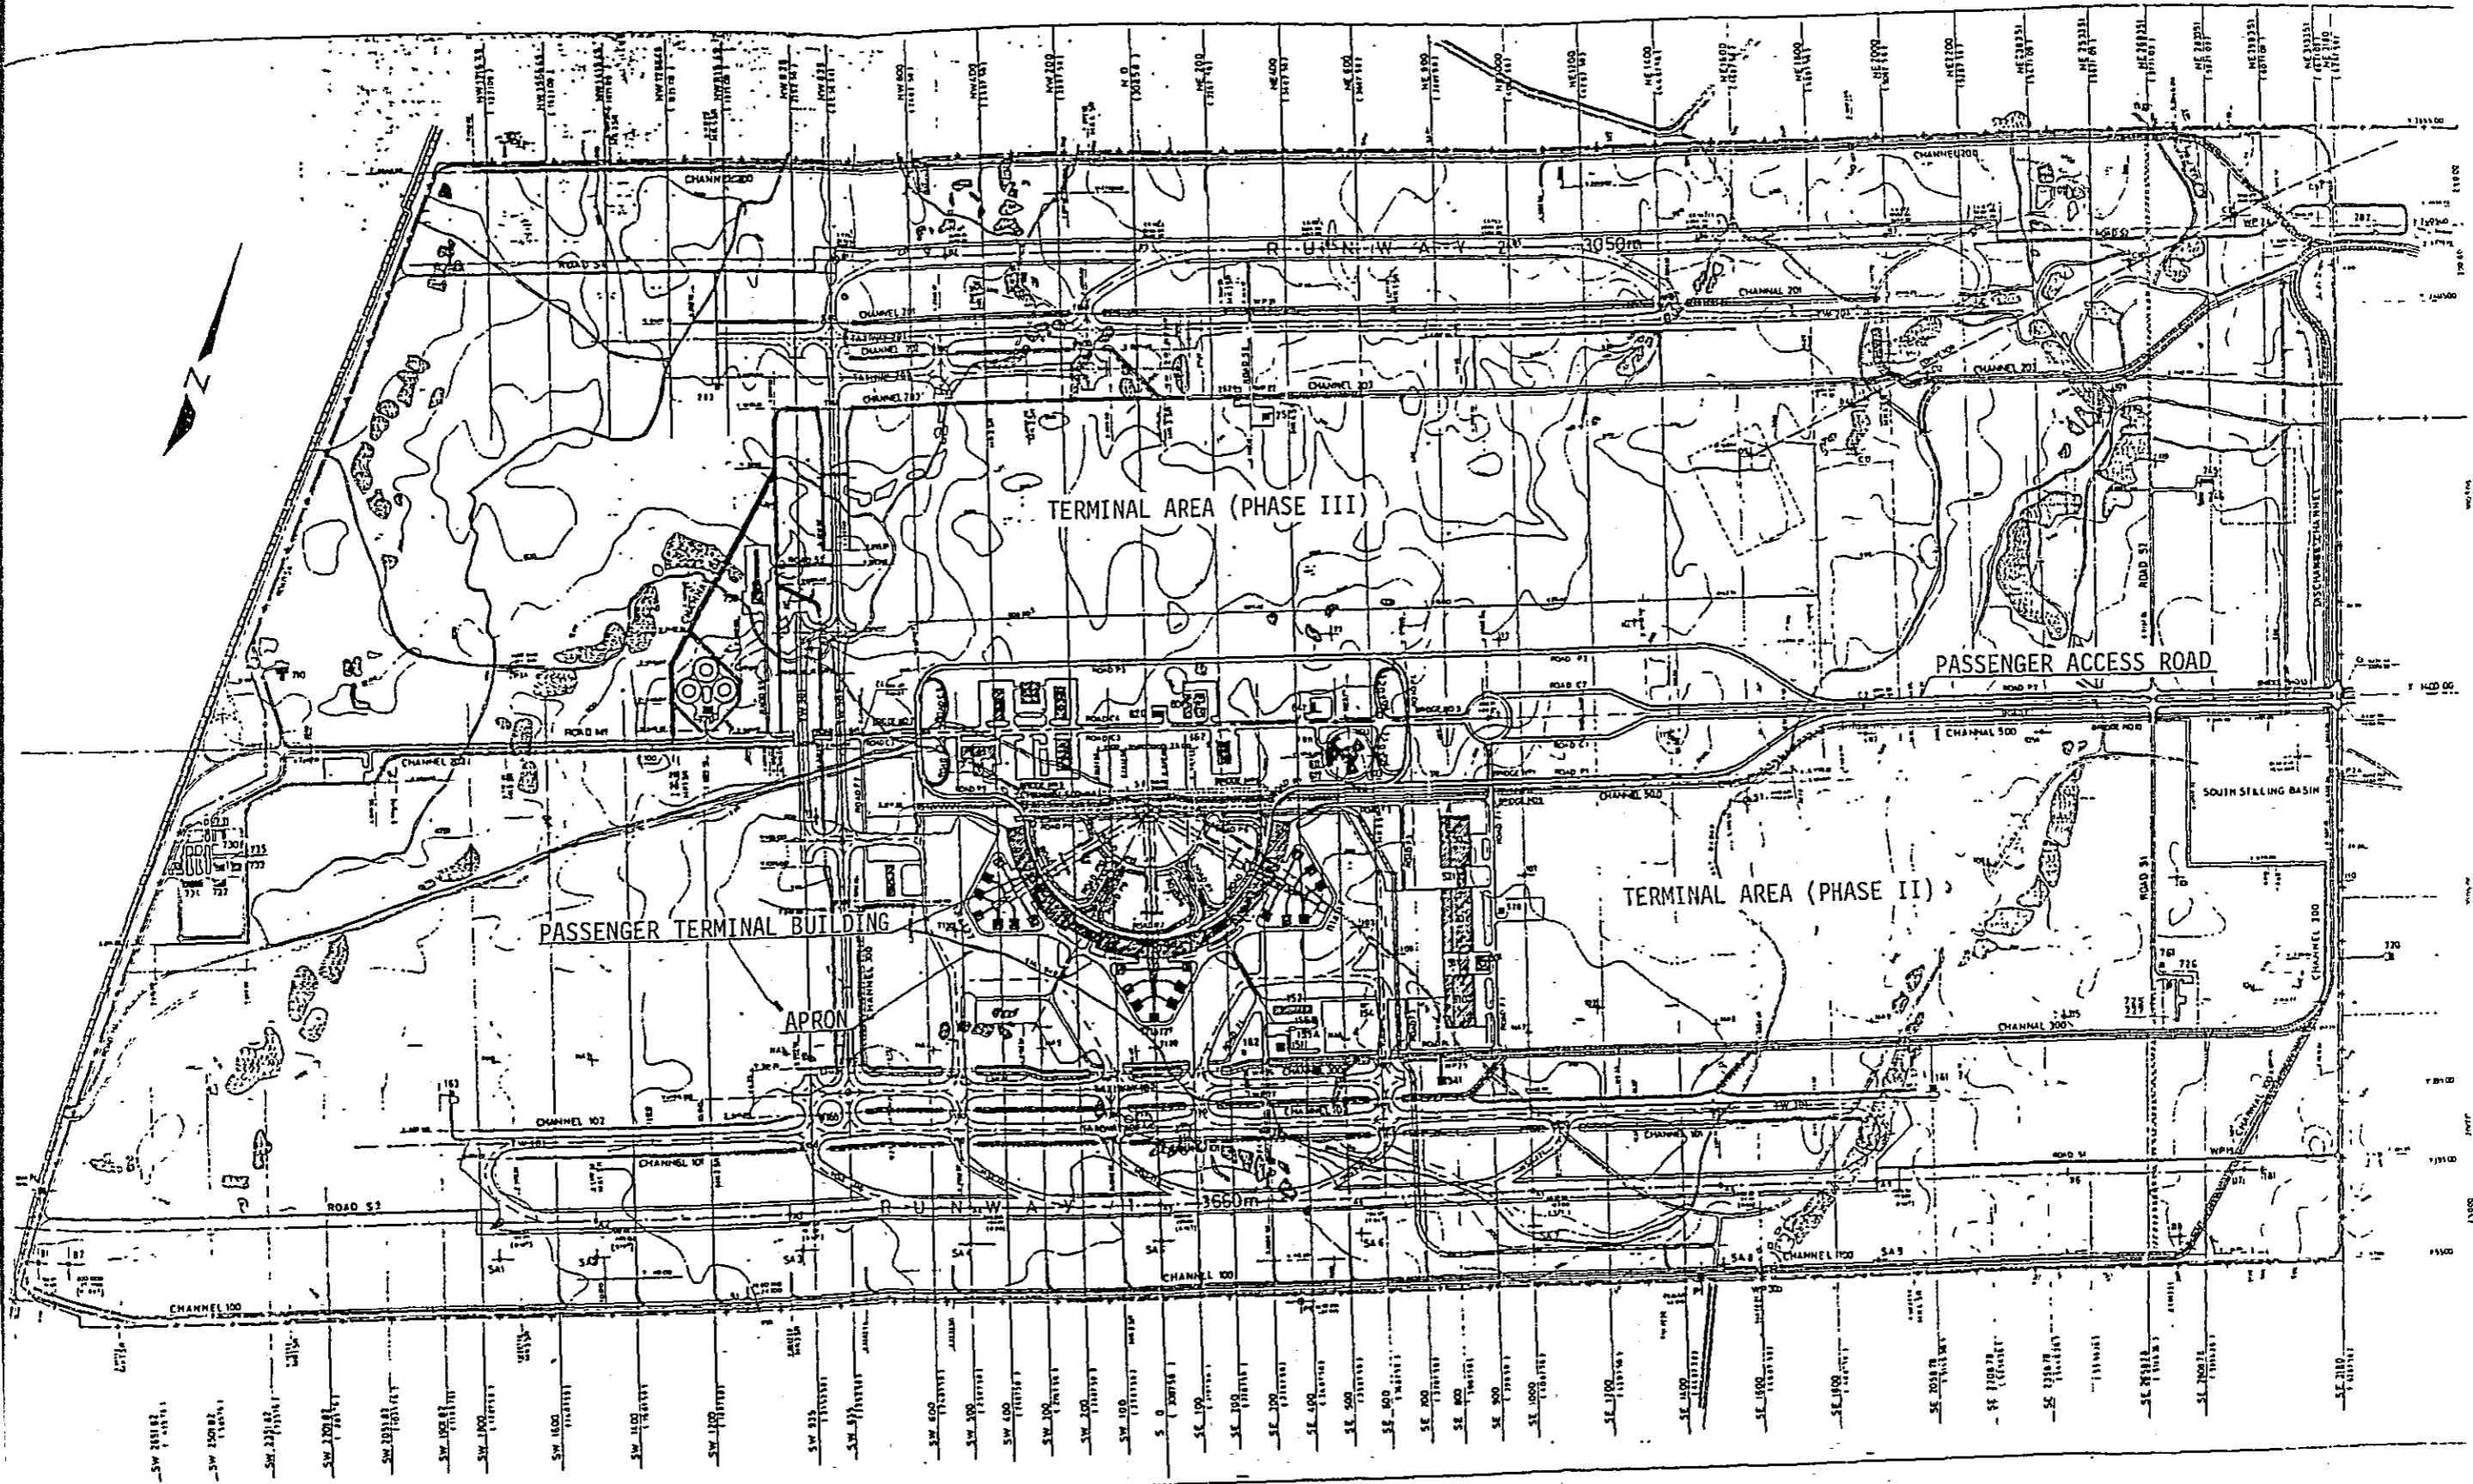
Layout Plan of Cengkareng Airport
